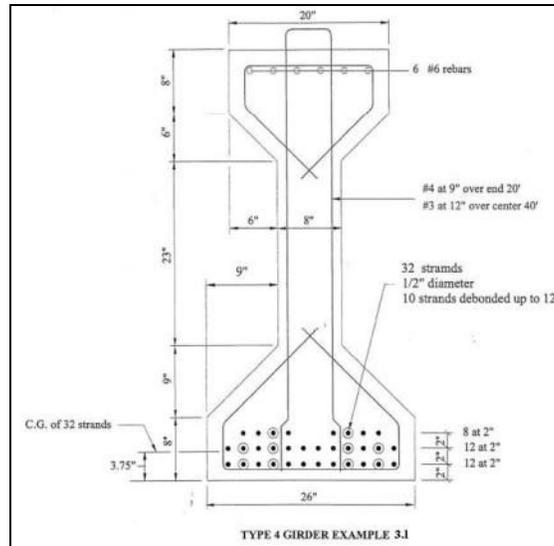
Prestressed-concrete bridge-rating example #1 I-girder
